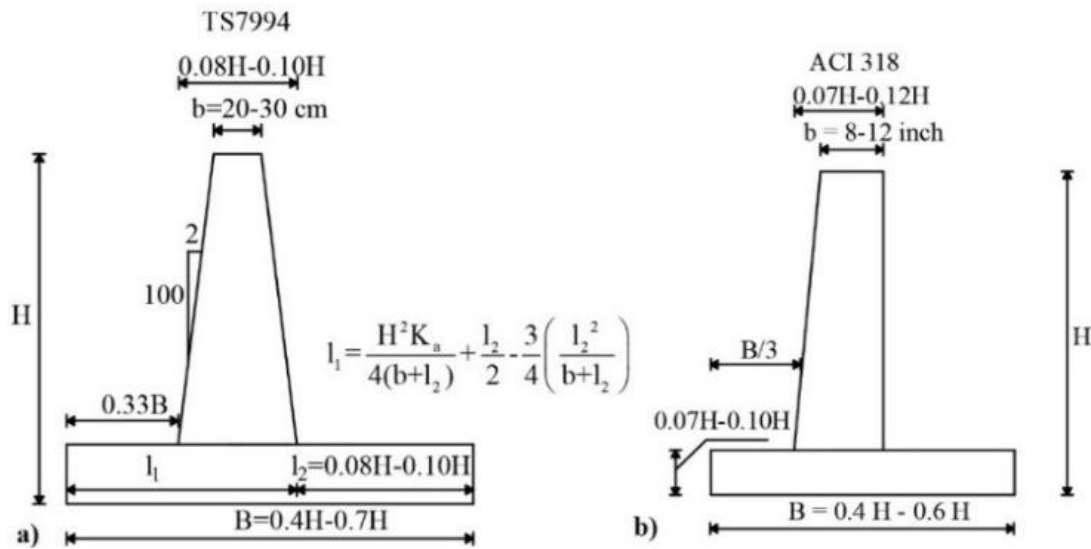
Cantilever retaining wall preliminary design guides (Uray et al. 2021).
